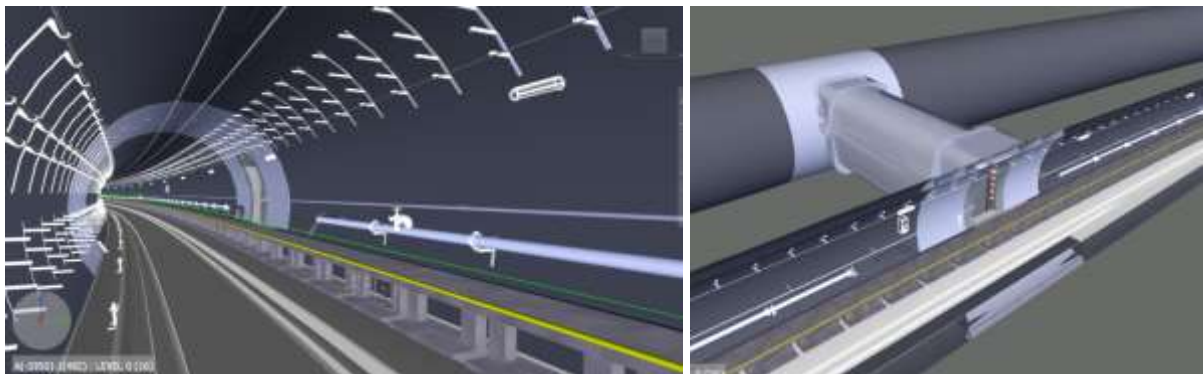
Side detrainment along tunnel walkway and Cross Passage are the exit and escape points at fire scenario
